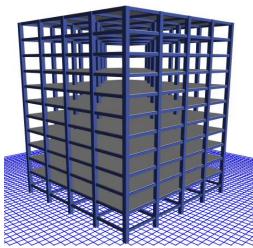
3D Rendered View Building Retrofitted with Jacketing
